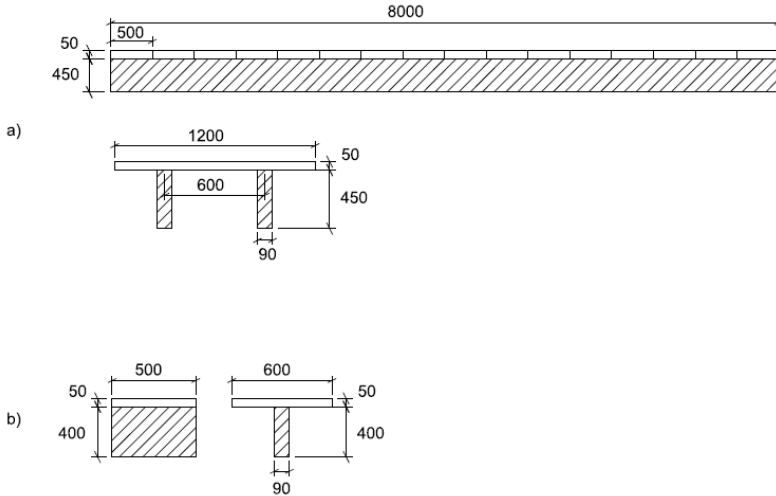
The full-scale beam above (a) and the shear test specimen underneath (b)
